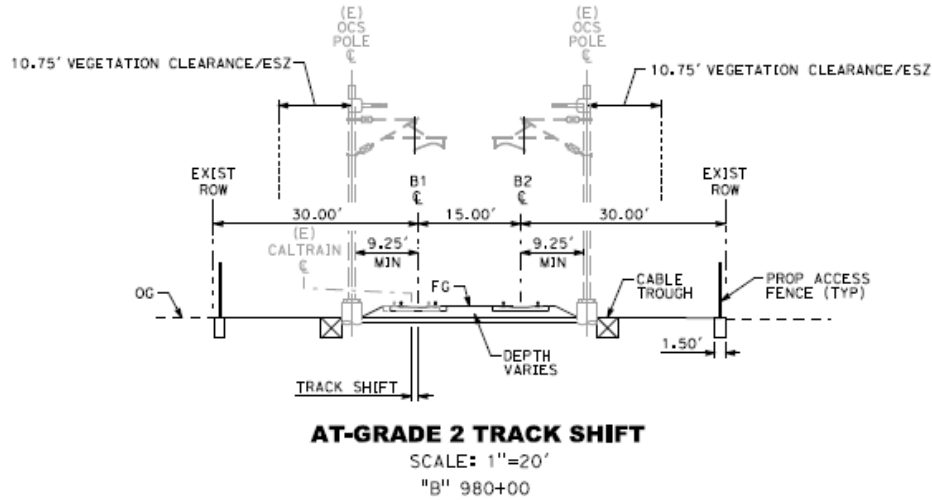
Typical Section - San Bruno to San Mateo Subsection
